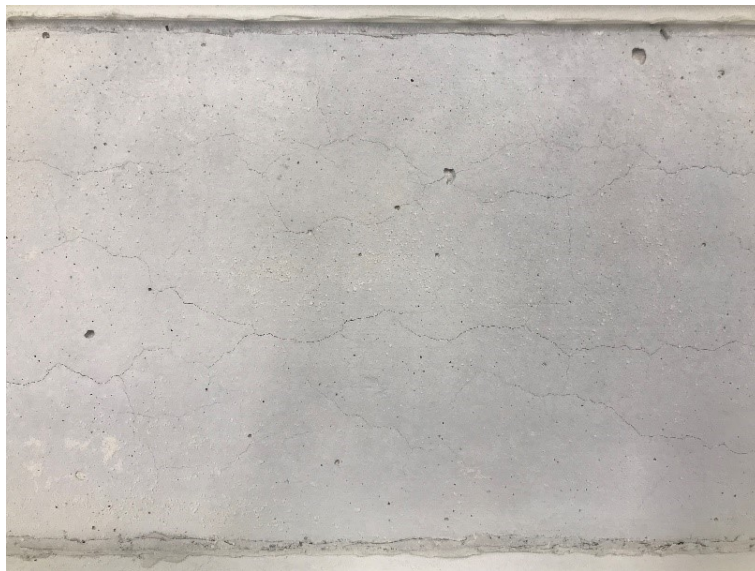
33 Longitudinal cracking on R2 beam surface
